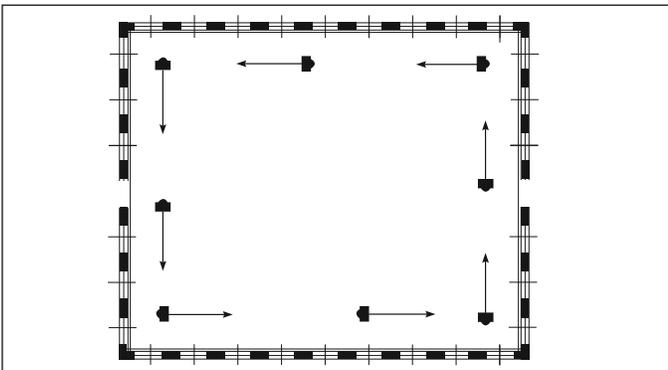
Unit Locations of Horizontal Units With 90° Hoods In Narrow Buildings
